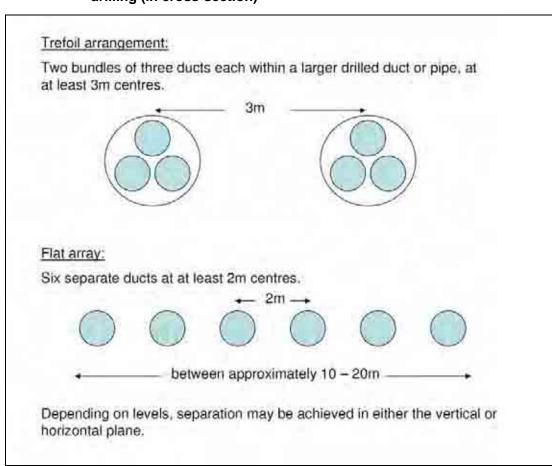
Two principle arrangements for spacing of ducts for directional drilling (in cross-section)
